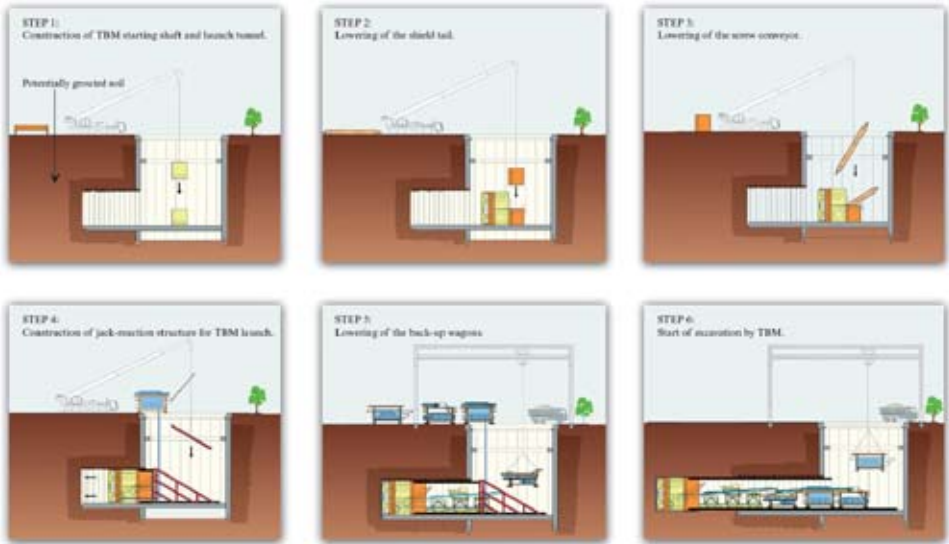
Typical steps for starting the TBM excavation from a launching shaft.
